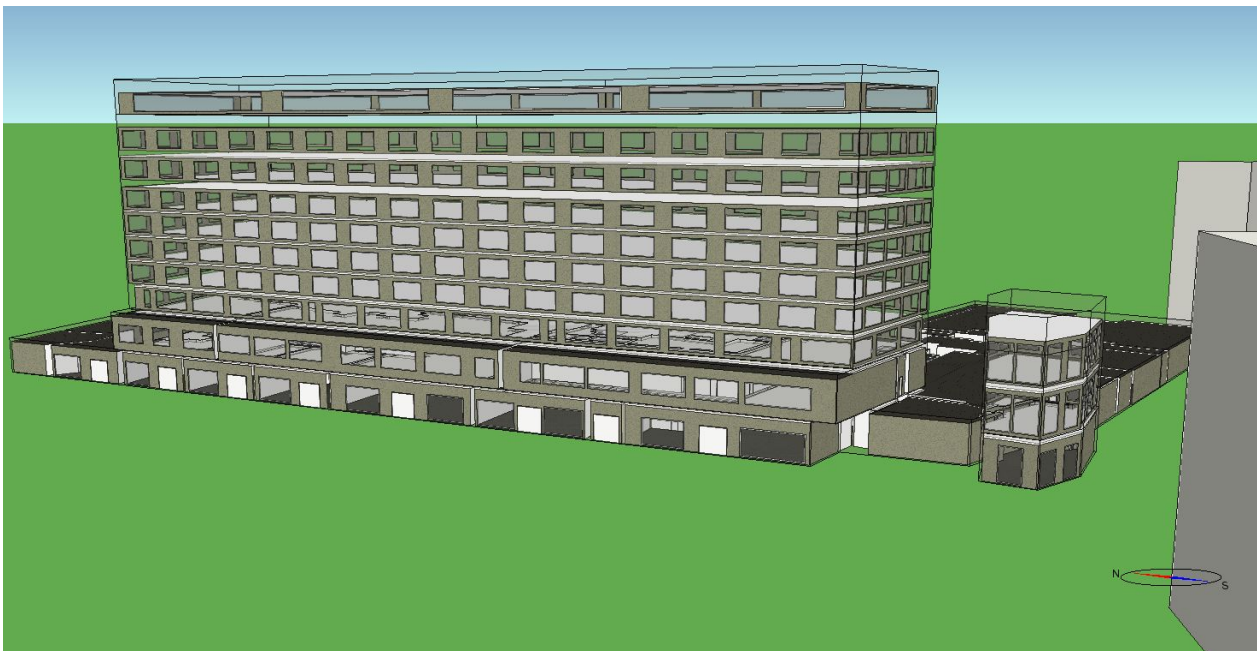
The complete 3d-modeled view of Sergelhuset. The outer walls are transparent and the floors are visible on the inside of the windows
